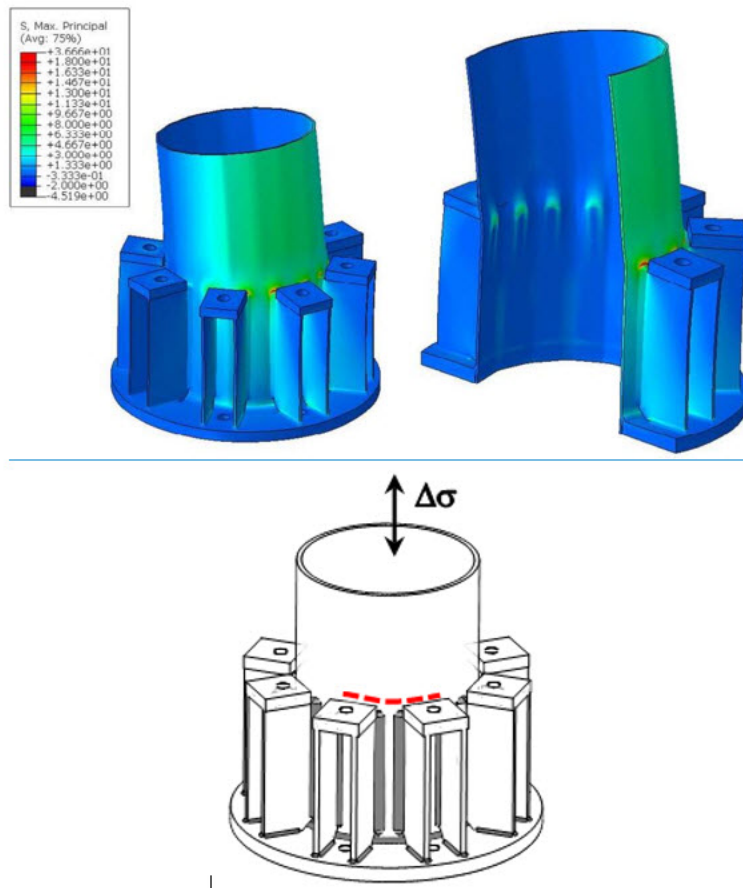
Fatigue cracking at a stool connection.
